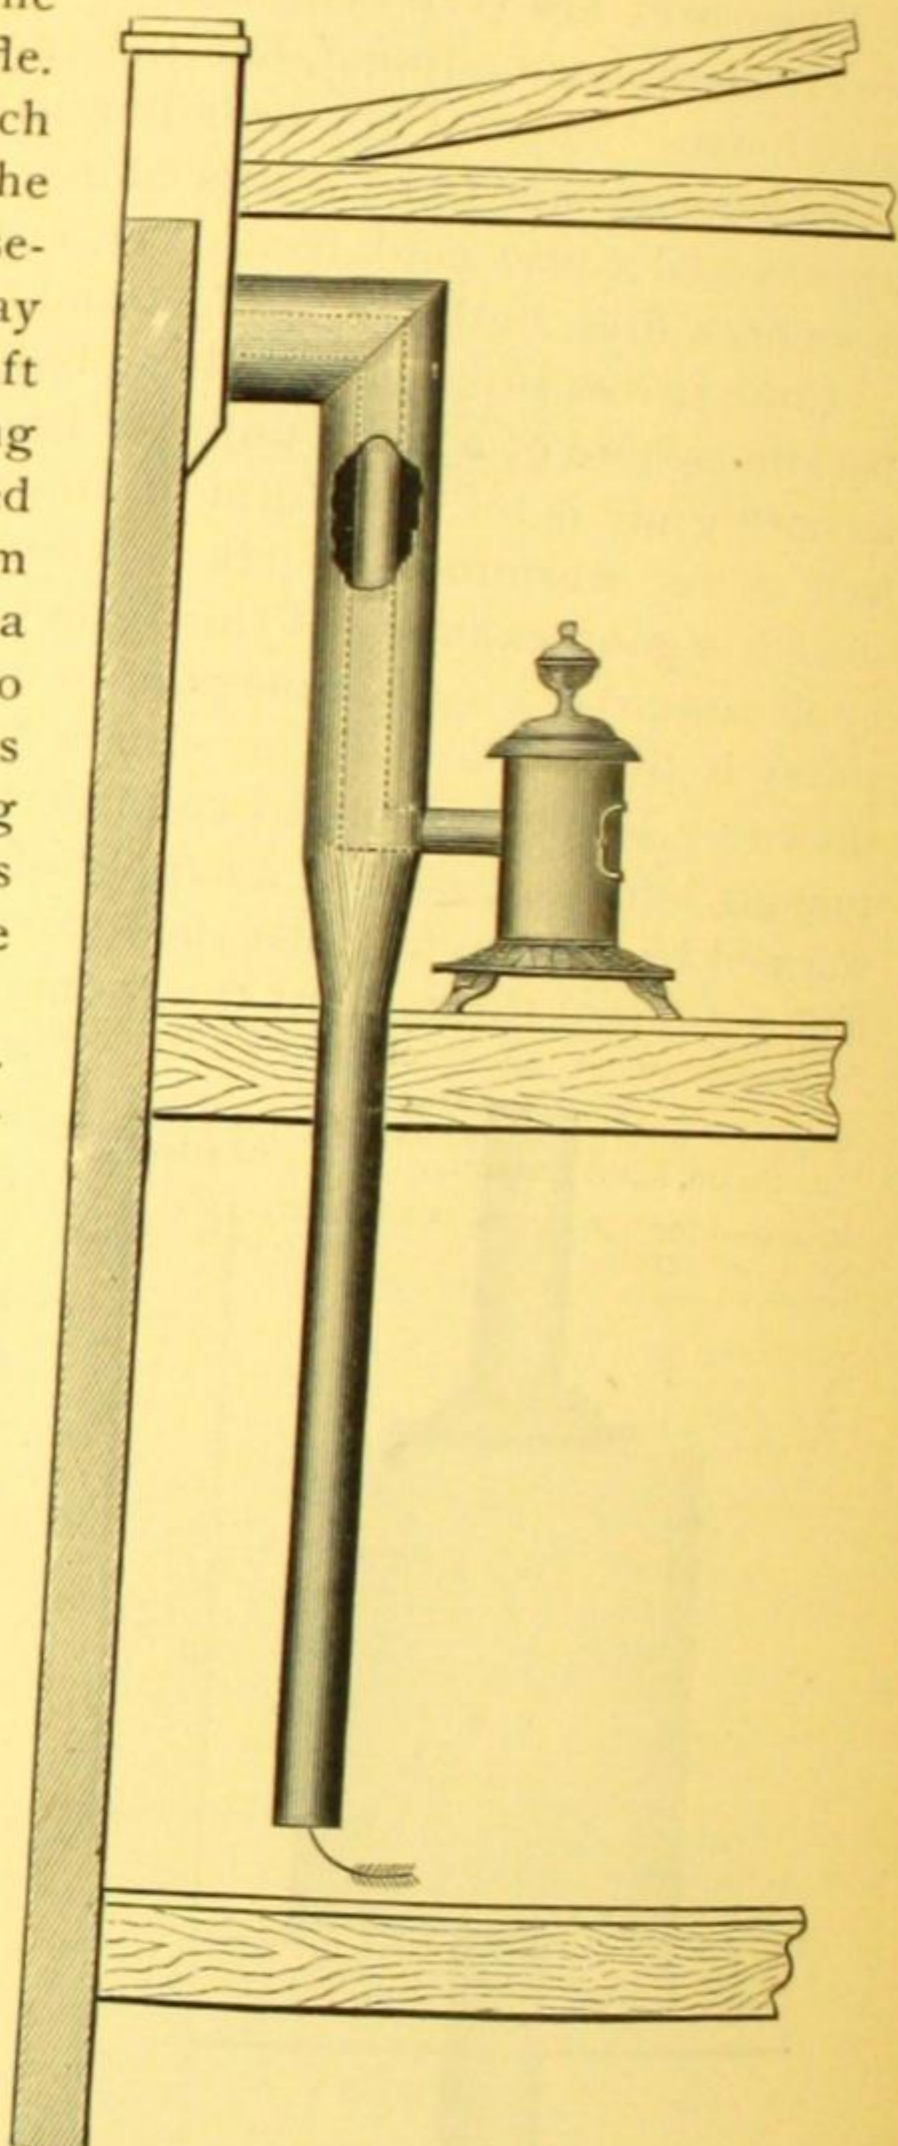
A Stove Pipe so arranged that it will assist in removing bad air.
